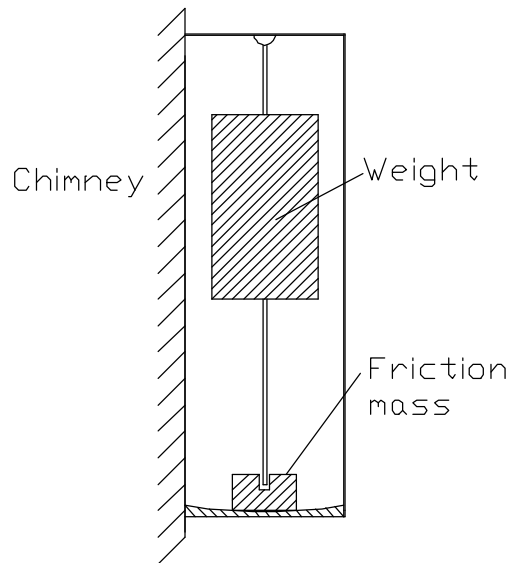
f The chimney is damped by using a pendulum mass with a bottom rod. A friction mass is guided by the rod. The damping is achieved by the friction mass that slips on a bottom plate.
